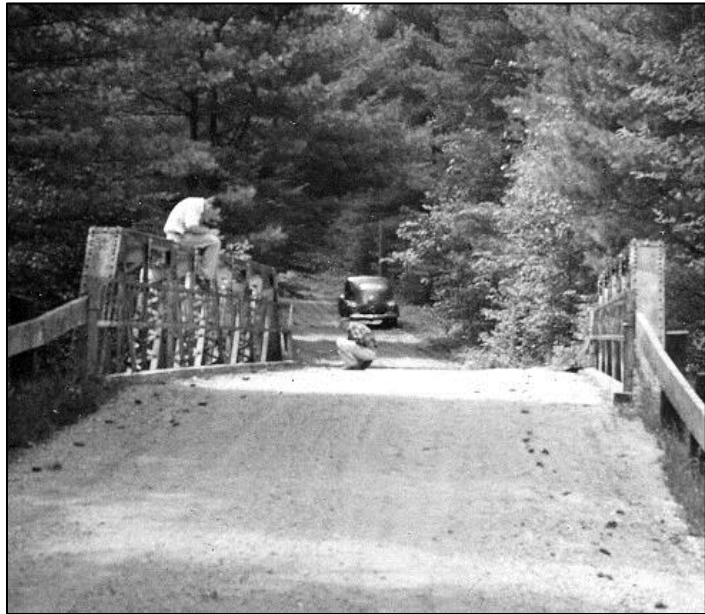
Warren pony truss carrying East Penacook Road over Blackwater River in Hopkinton, NH, built 1907, replaced 1967. This 70' bridge was typical of many designed by John Storrs and built by United Construction Company. Note the two NHHD engineers making notes and sketches of the bridge during an inspection on May 27, 1942 (NHHD Bridge Inventory Card, Hopkinton 134/166).
